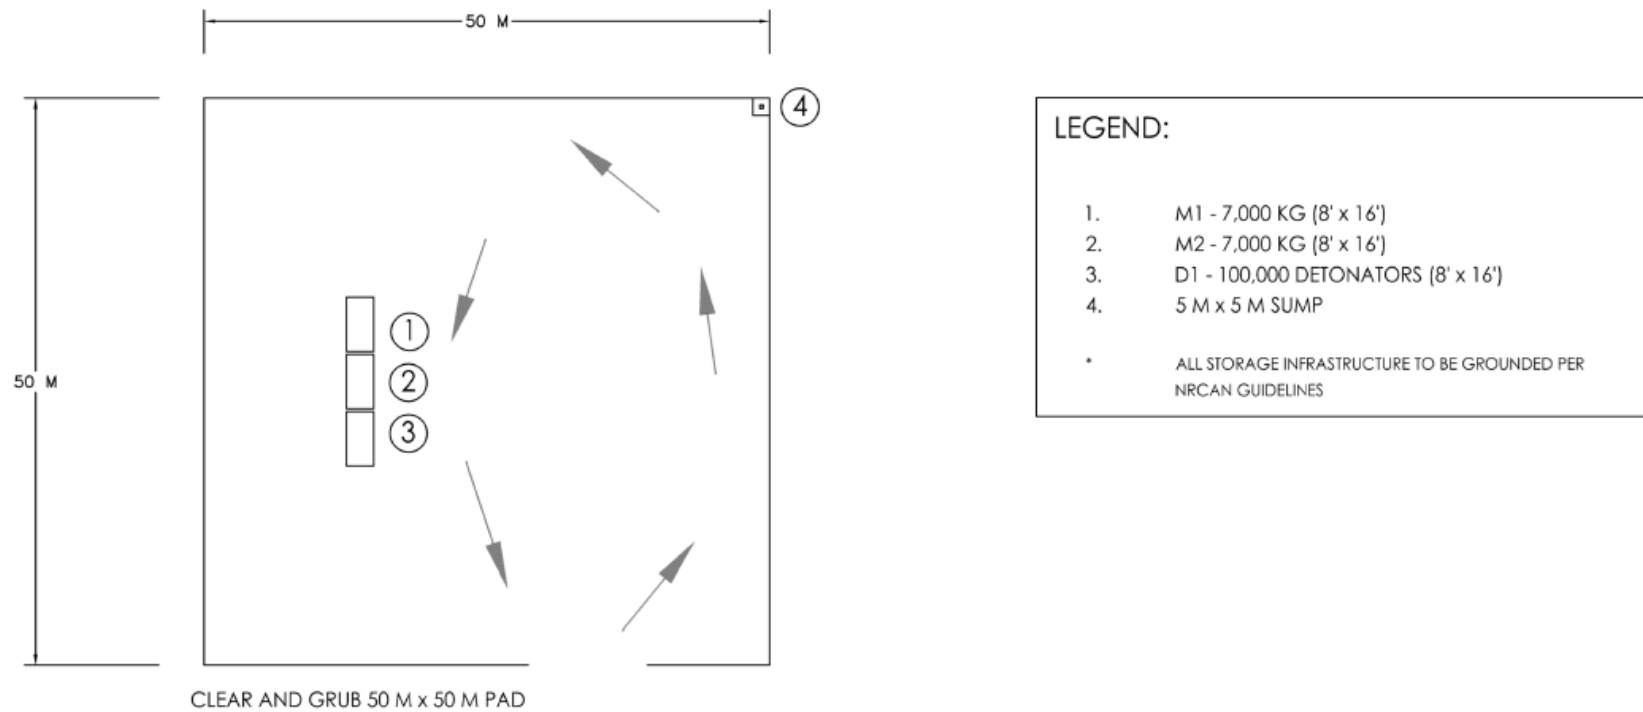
Plan of the proposed Explosive Magazine storage location
